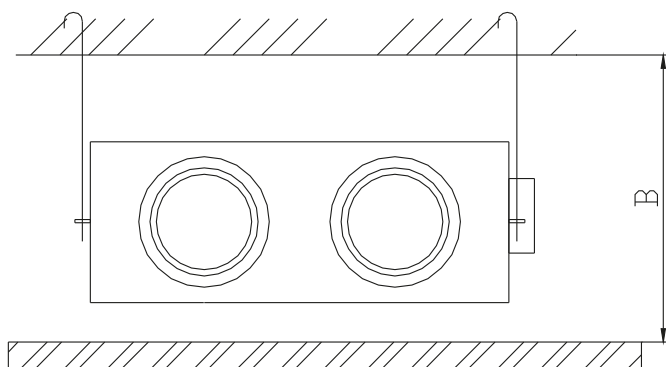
Minimum distance between the ceiling and the suspended ceiling.
